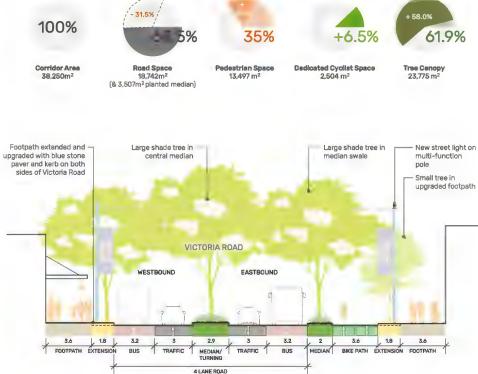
Victoria Road Section (1:200) Typical Proposed Configuration
